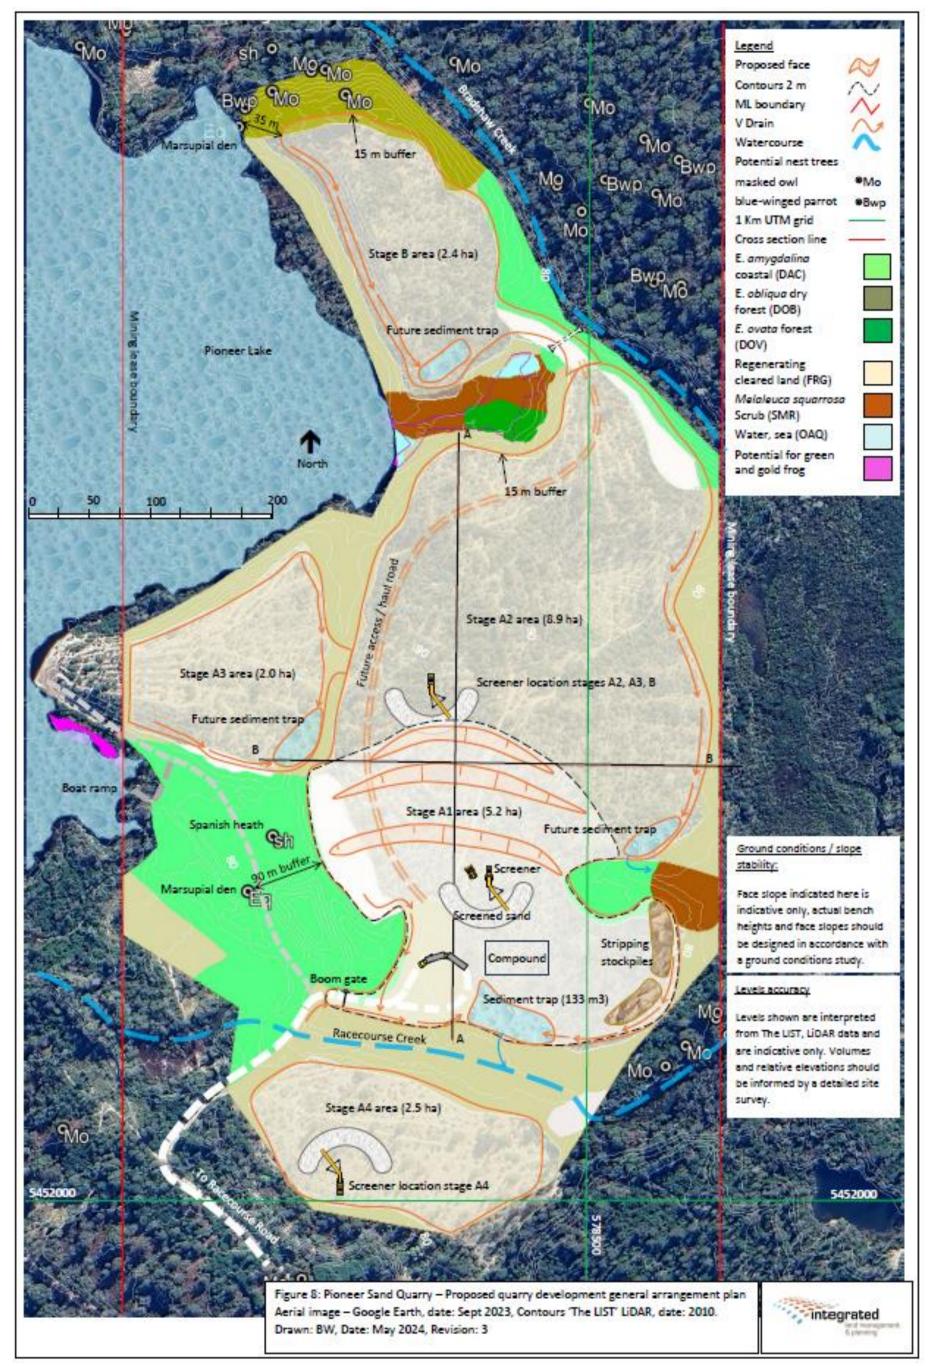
Pioneer Sand Quarry – Proposed quarry development general arrangement plan including route of future on-site single haul access road
